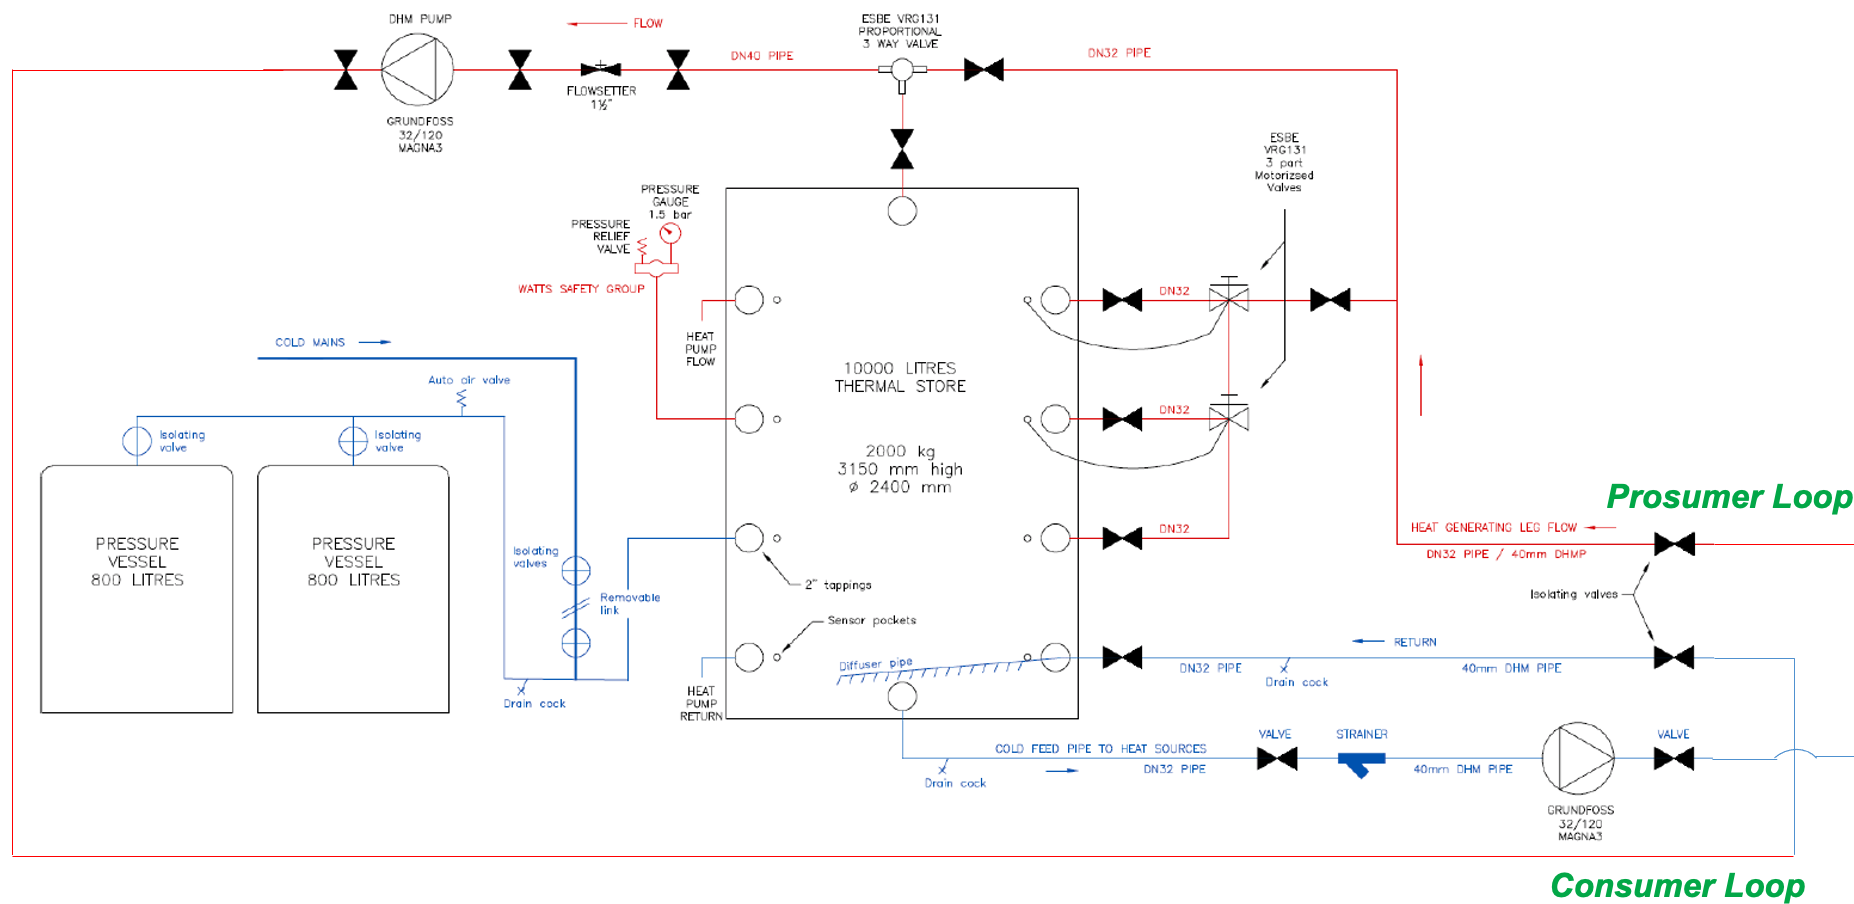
The schematic hydraulic layout of the central thermal store [170].
